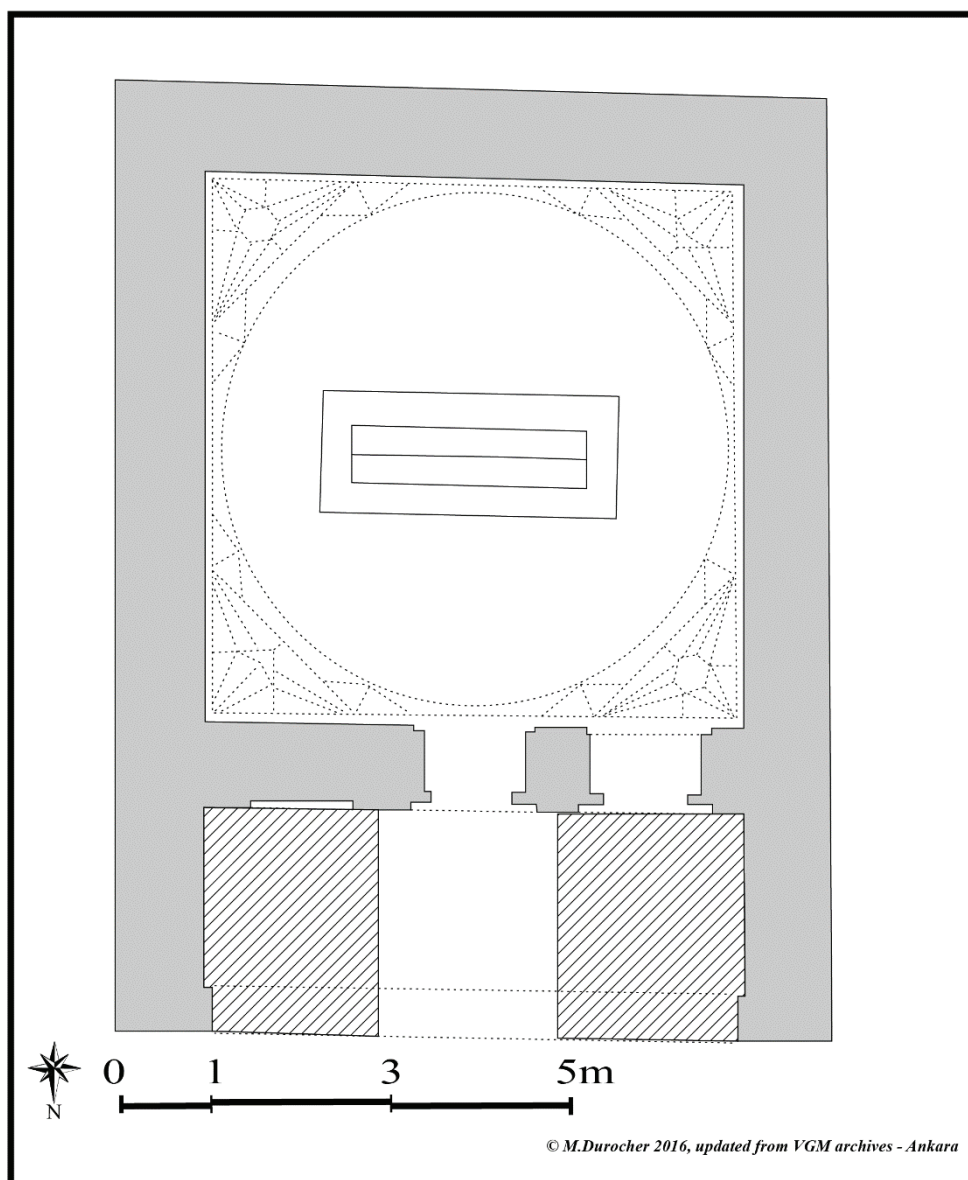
Mausoleum Ali Baba, floor plan (© M. Durocher 2016)
